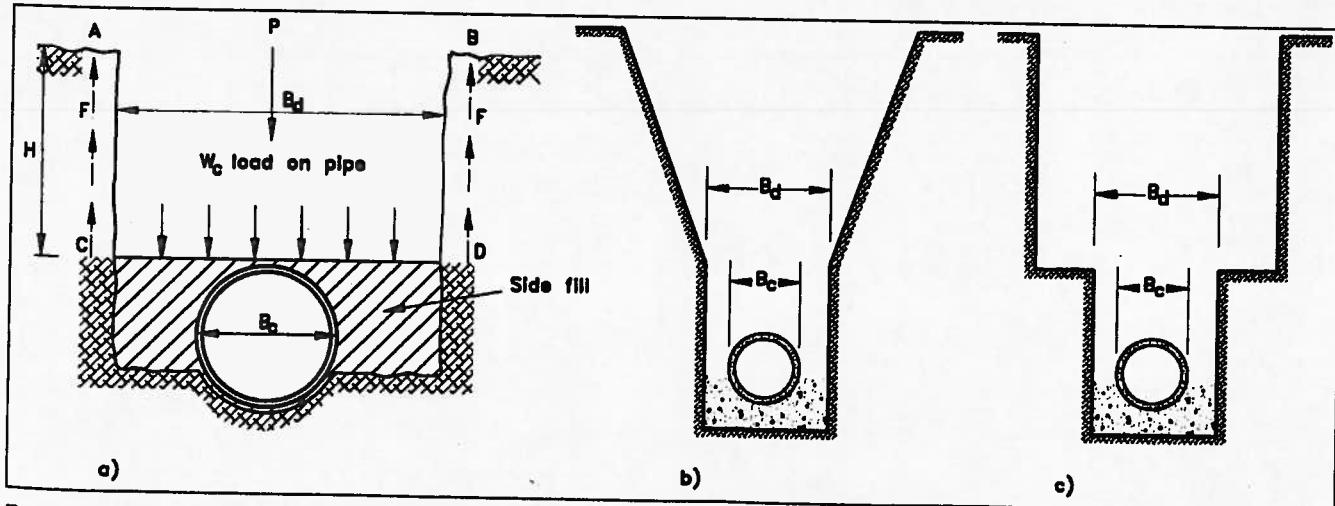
Typical trench conditions for a rigid conduit. (From *Design and Construction of Sanitary and Storm Sewers, Manual of Practice No. 9*, ASCE 1969. Reprinted with permission from the American Society of Civil Engineers, New York, New York)
